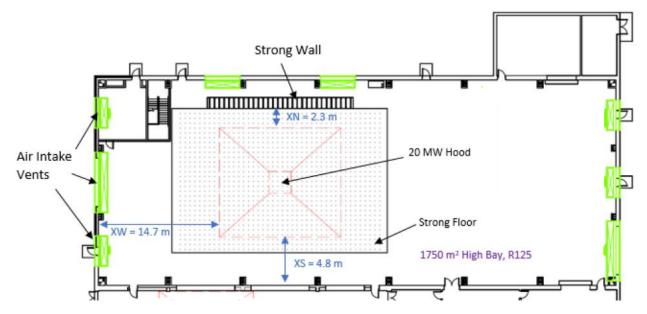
Floor plan of the National Fire Research Laboratory's Room 125, housing the 20 MW exhaust hood.
